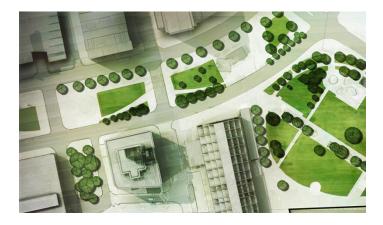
Layout between Buildings and Environment (Landscape Amman - Jordan)
